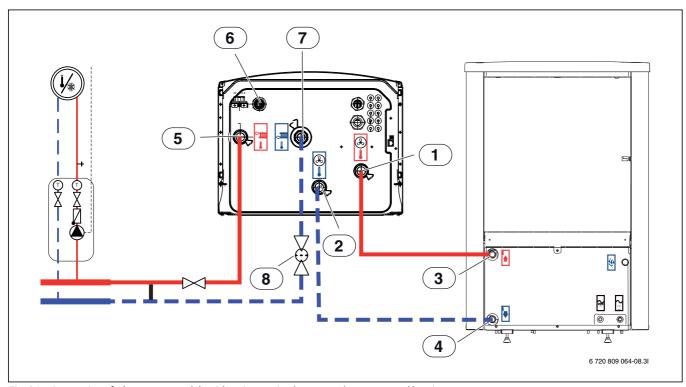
Connection of a heat pump module with an immersion heater to a heat pump and heating system
